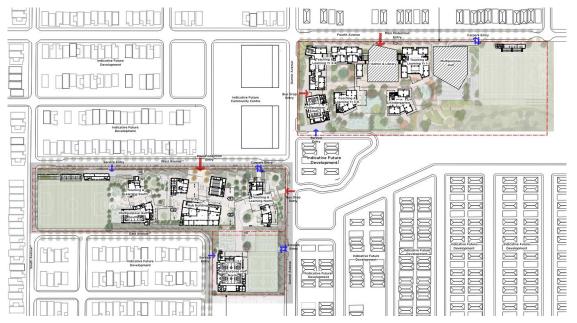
Proposed Master Plan for Primary and Secondary School (Source: PMDL)
